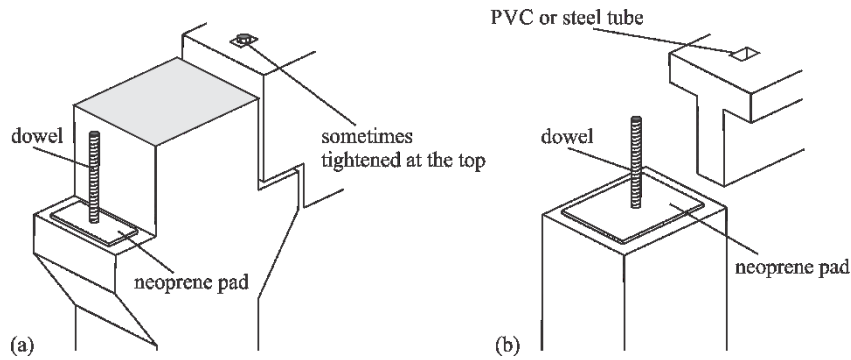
Beam-to-column dowel connection: (a) the connection constructed on the corbel and (b) the connection constructed at the top of the column (Zoubek, 2015)
